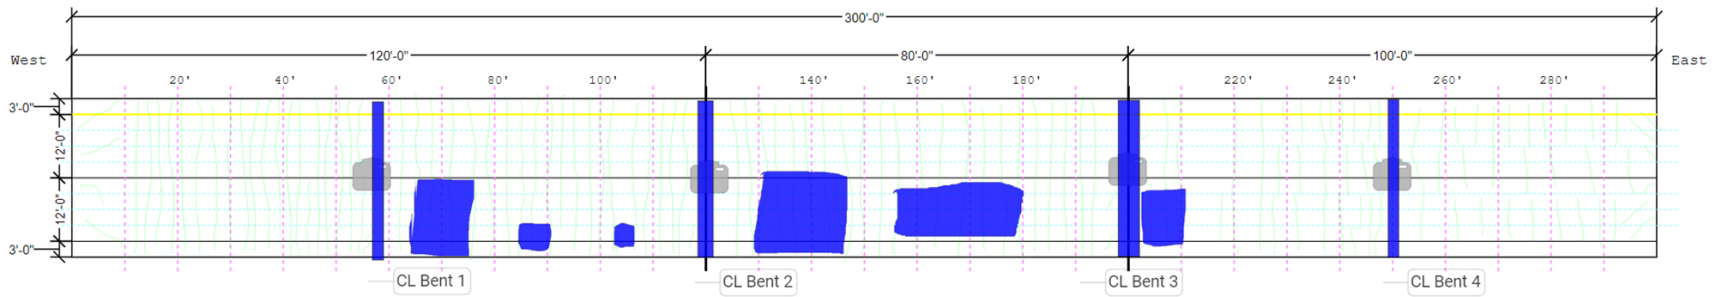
Field notes for Bridge 1367, 2020 inspection, soffit.
